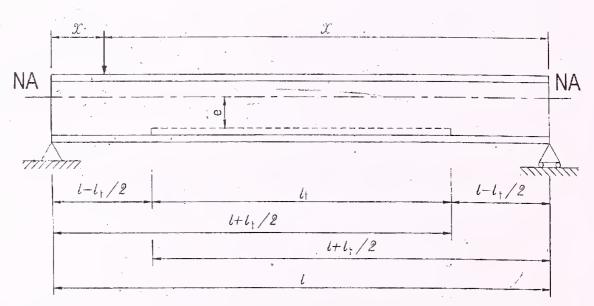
Intervals along prestressed girders for action of unit load.
